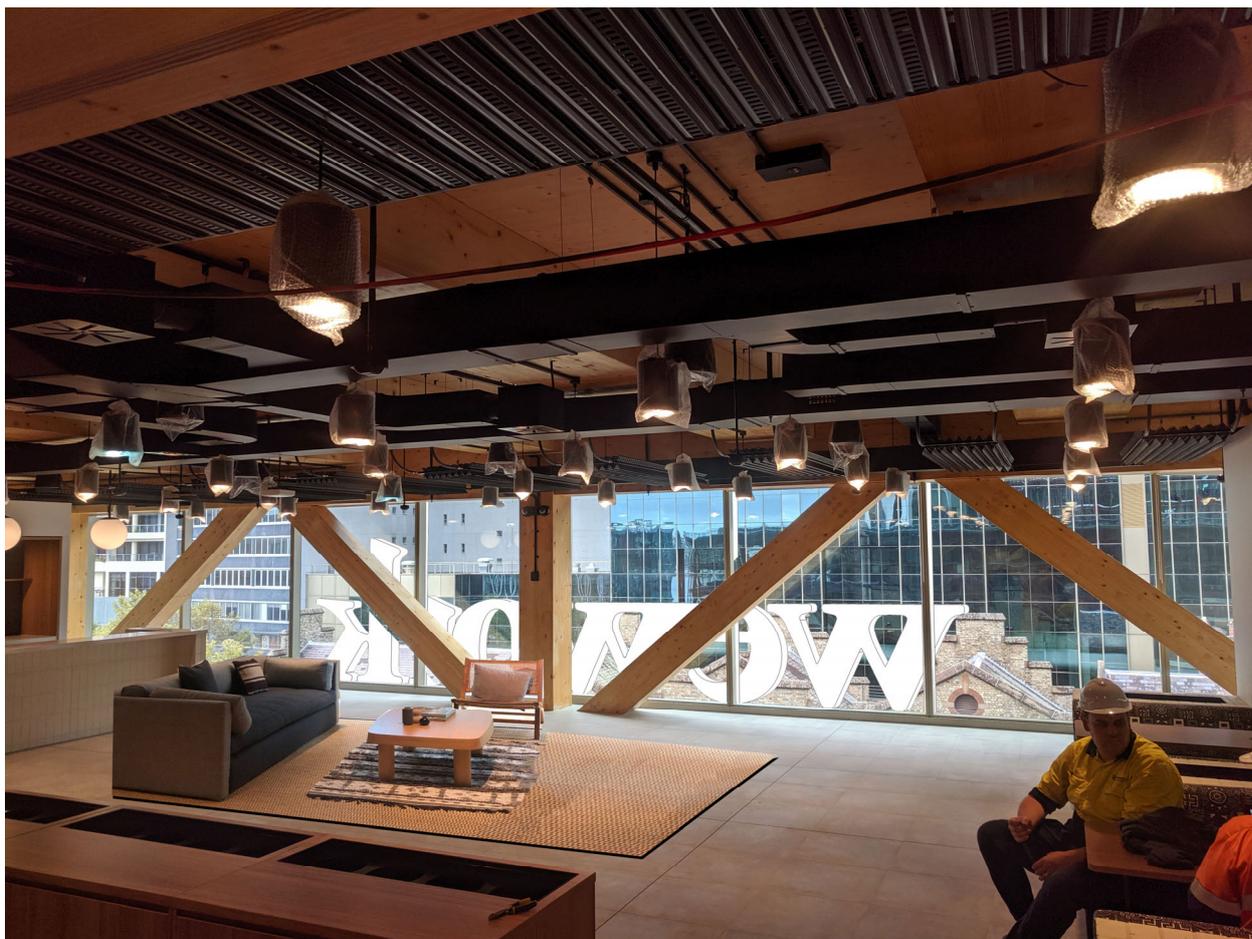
\_ Visualisation of Daramu House east façade WeWork external signage viewed from Level 6 floor plate
